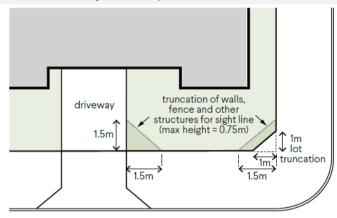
Truncation at street corner to provide sightlines (refer A3.8.7).
